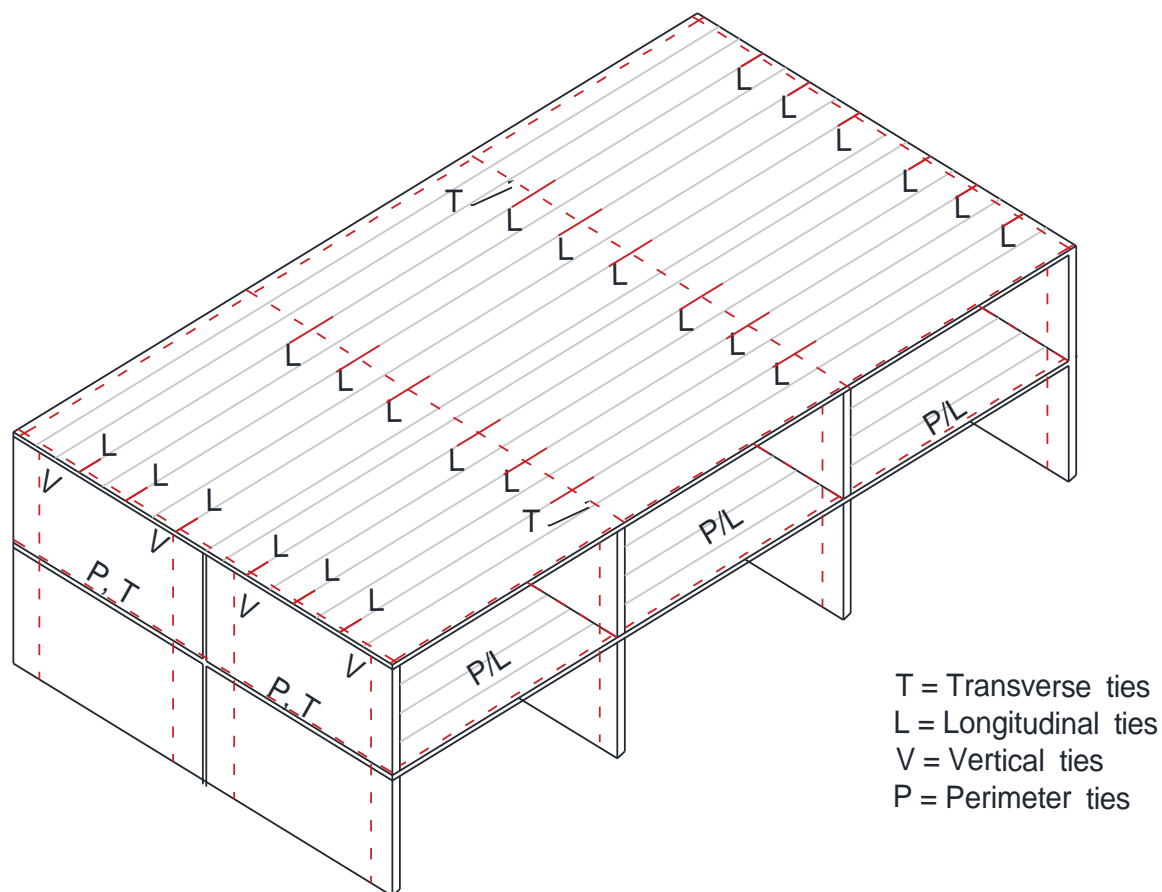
Typical arrangement of integrity ties in HCS floor diaphragms supported in precast concrete walls - Reproduced from ACI 318 (ACI 2019).
